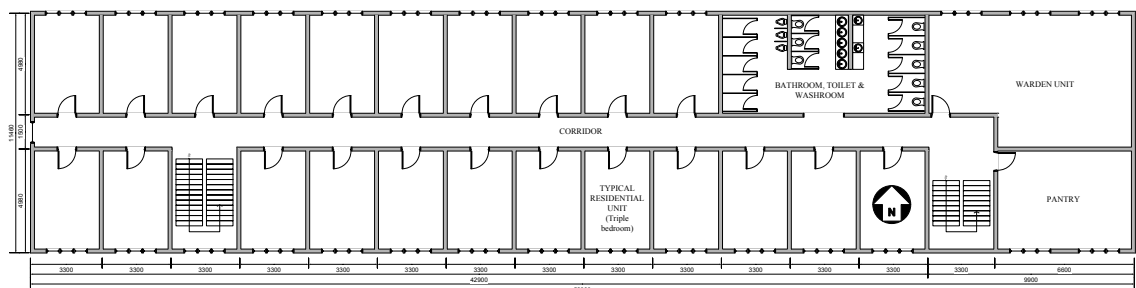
Floor plan of 4th RC (new additional residential block - Block D)
